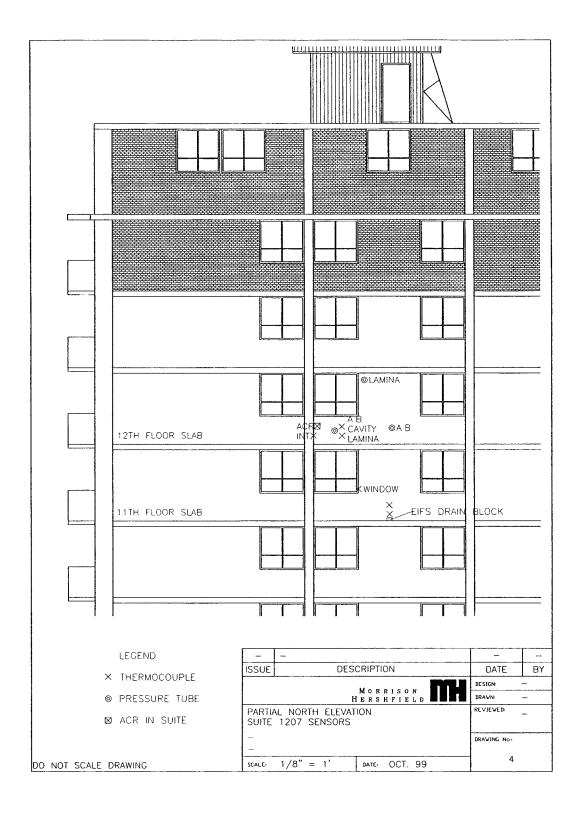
Drawing No. 4: Partial North Elevation – Suite 1207 Sensors
